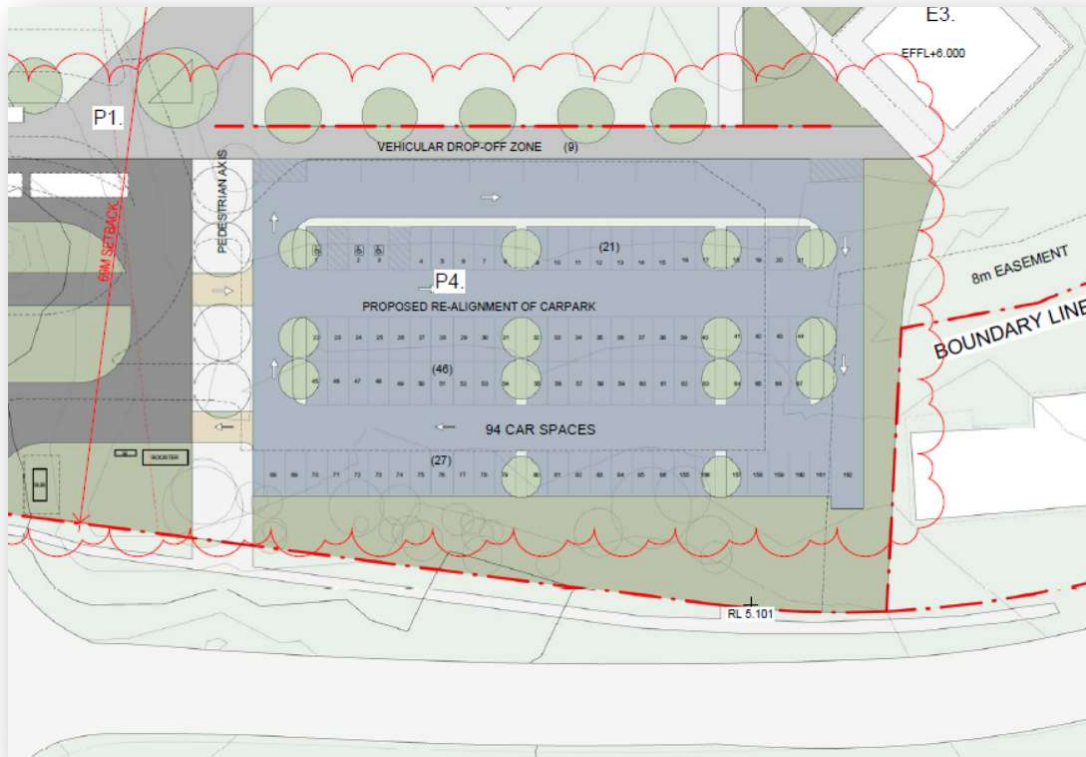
Extract from Front of Campus Site Plan (Drawing DA-11-21) showing the extended Main Carpark (P4) (Source: Cox Architecture 2023)
